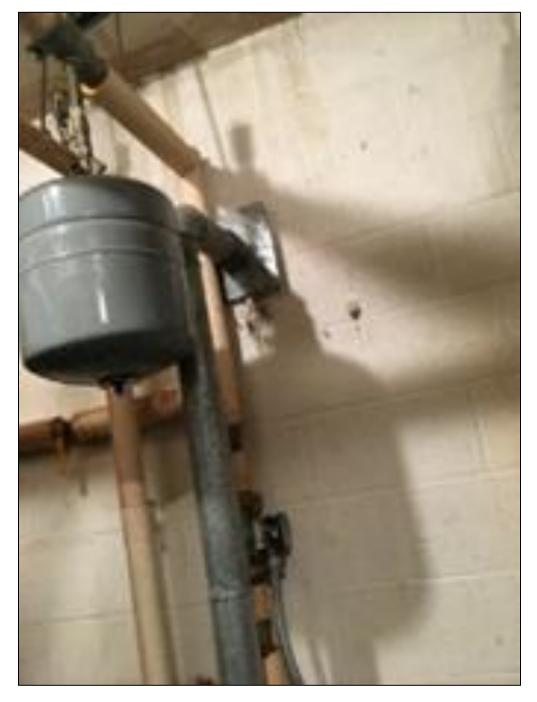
Fire Hall - Gap Between Mechanical Pipe and Exterior Wall
